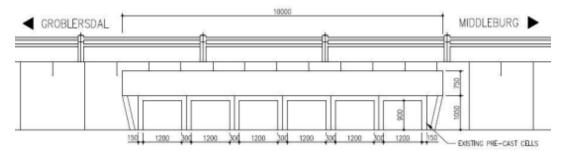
Major Culvert at km 1.38 culvert elevation
